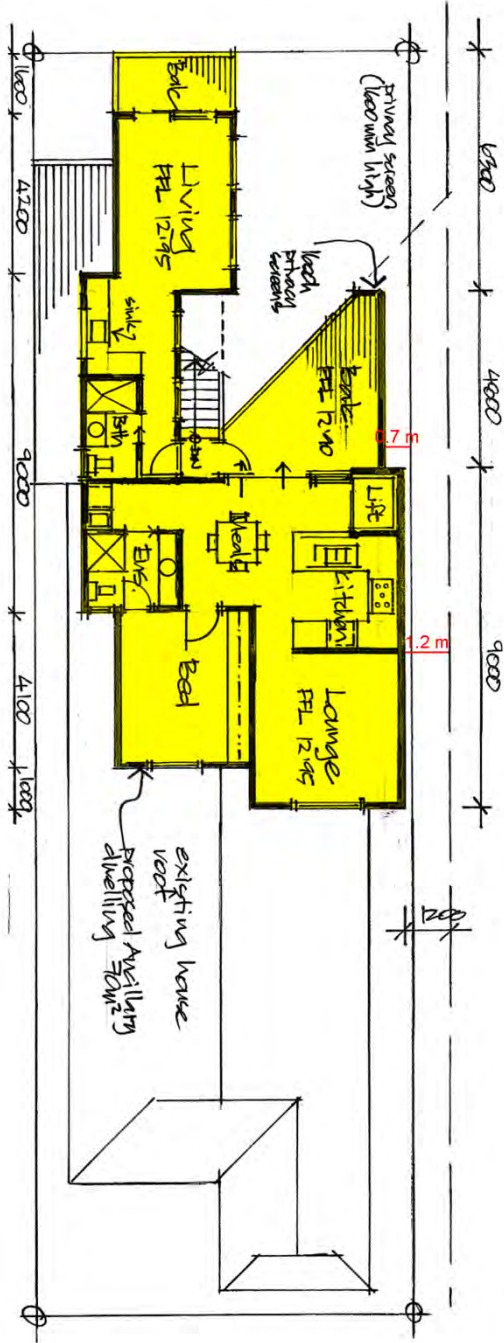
Upper floor layout illustrating setbacks from balconies and major openings in relation to adjoining properties.
